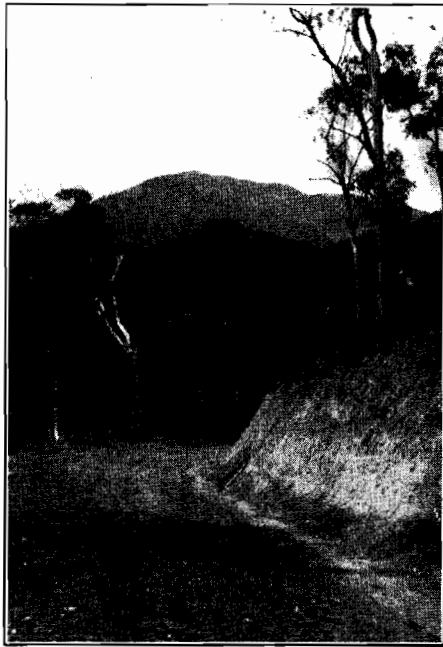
Showing section of the Upper Kiewa Valley Road above referred to.
